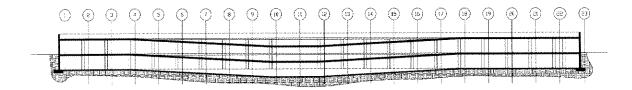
Trader's Lane Parking Structure Floor Plans (Total Parking Spaces = 412 from Reference 2)
